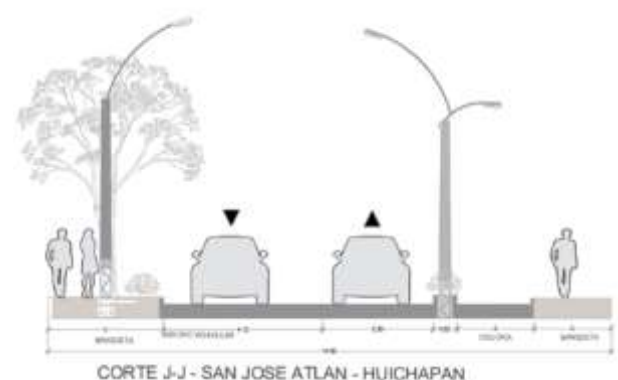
Road design proposal for the San Jose Atlán - Huichapan stretch
